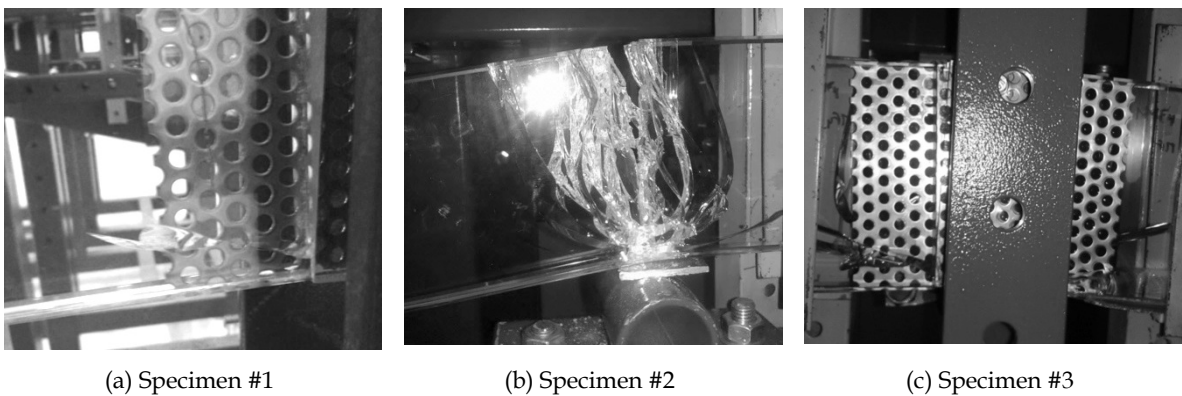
Close-up view of the initial failure crack of each specimen.
